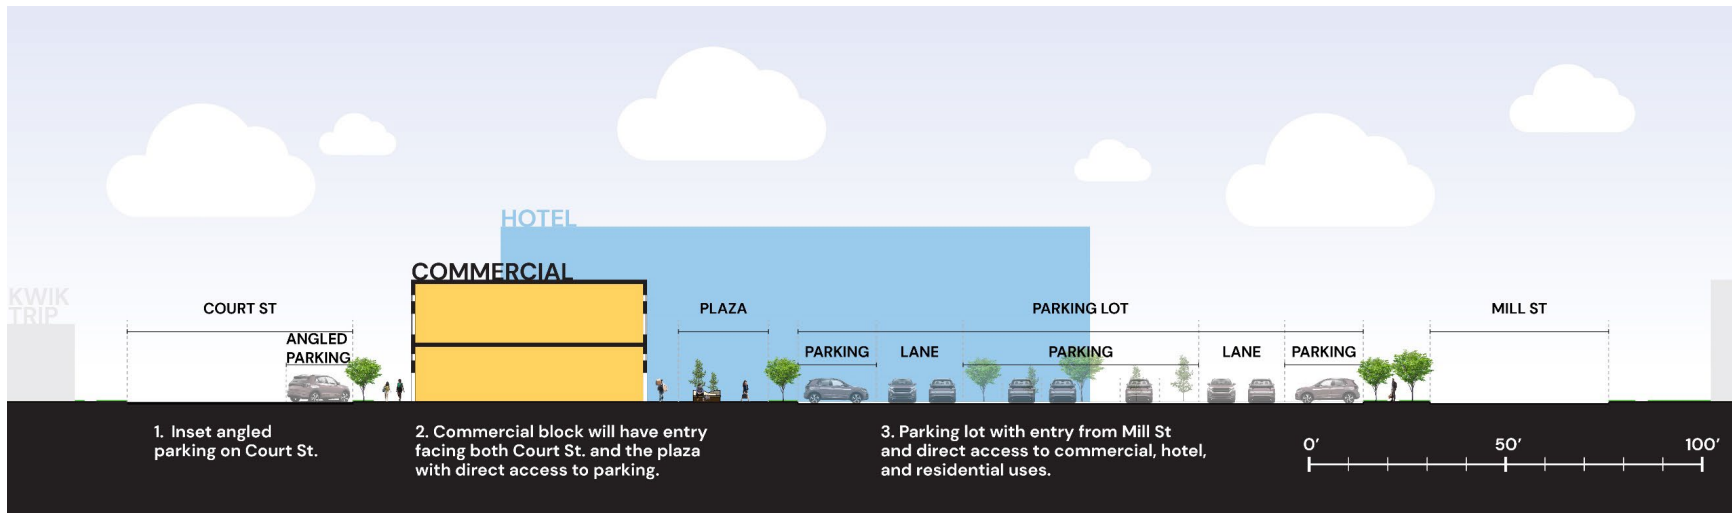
Section through W Court St, Building 2, the parking lot, and Mill Street illustrating access and basic streetscape.
